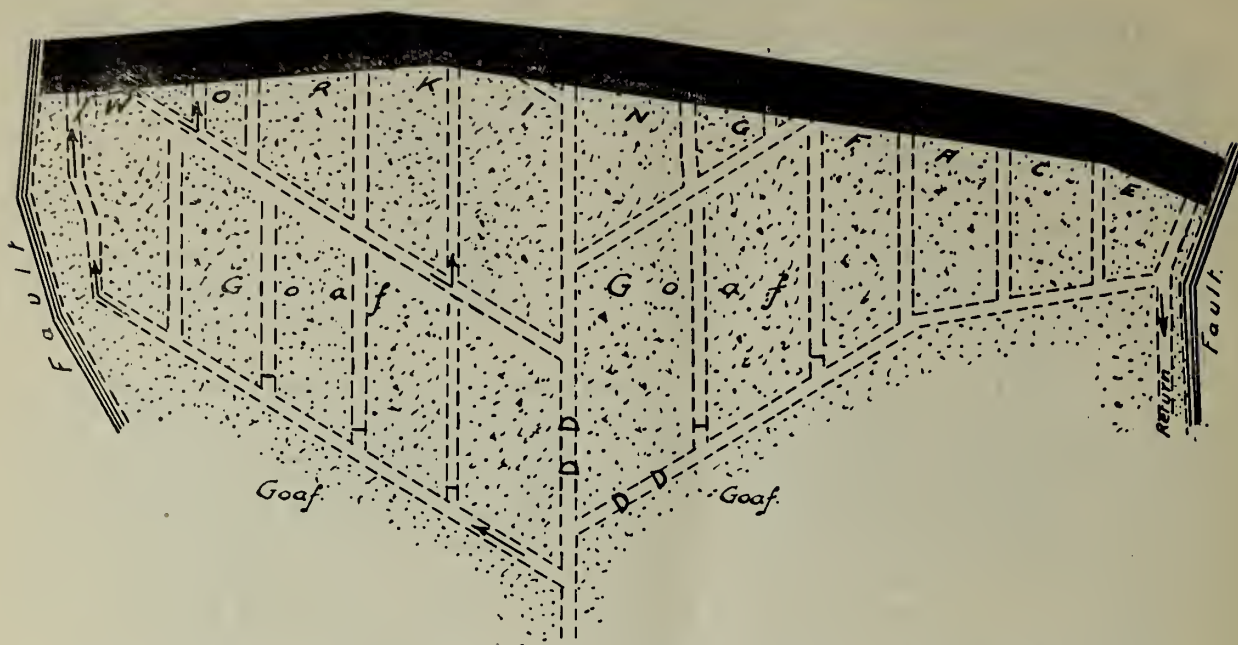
CANNOCK AND RUGELEY COLLIERIES. LONGWALL METHOD OF WORKING (Q. 10,158).
